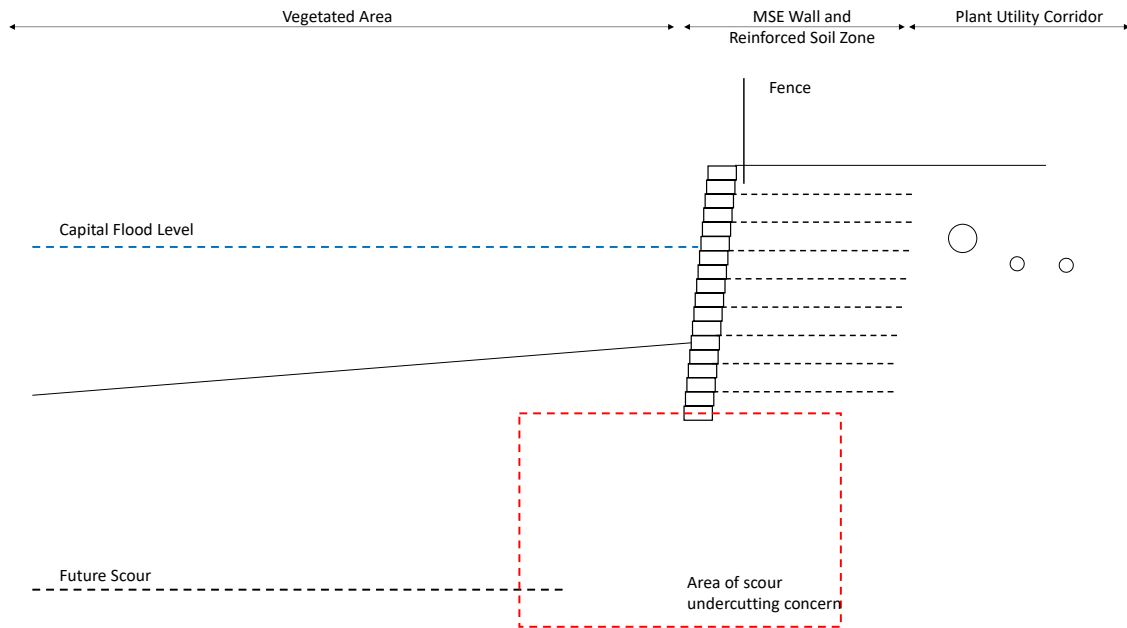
Schematic of the MSE Wall along the Plant riverbank edge
